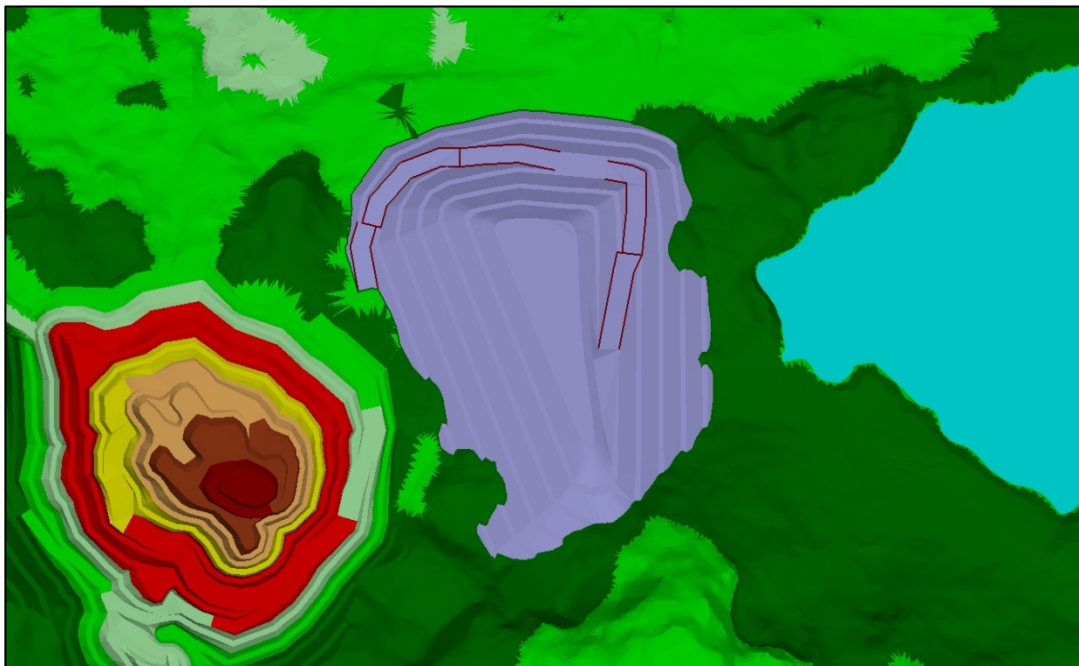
BYG-Krian: 3D View of Pit & Waste Landform Design
